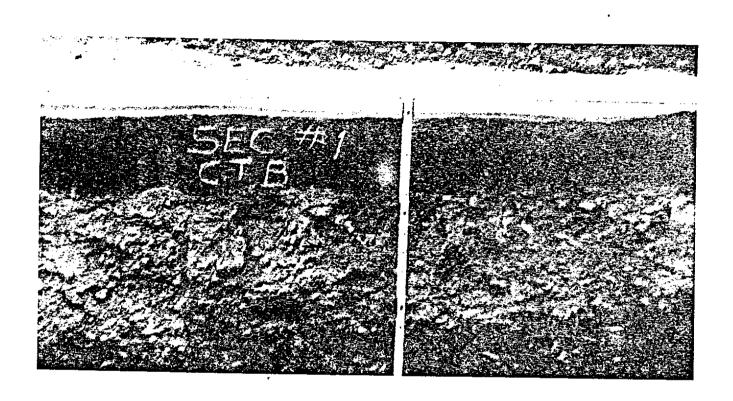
SECTION 1, CTB, CROSS-SECTION.
